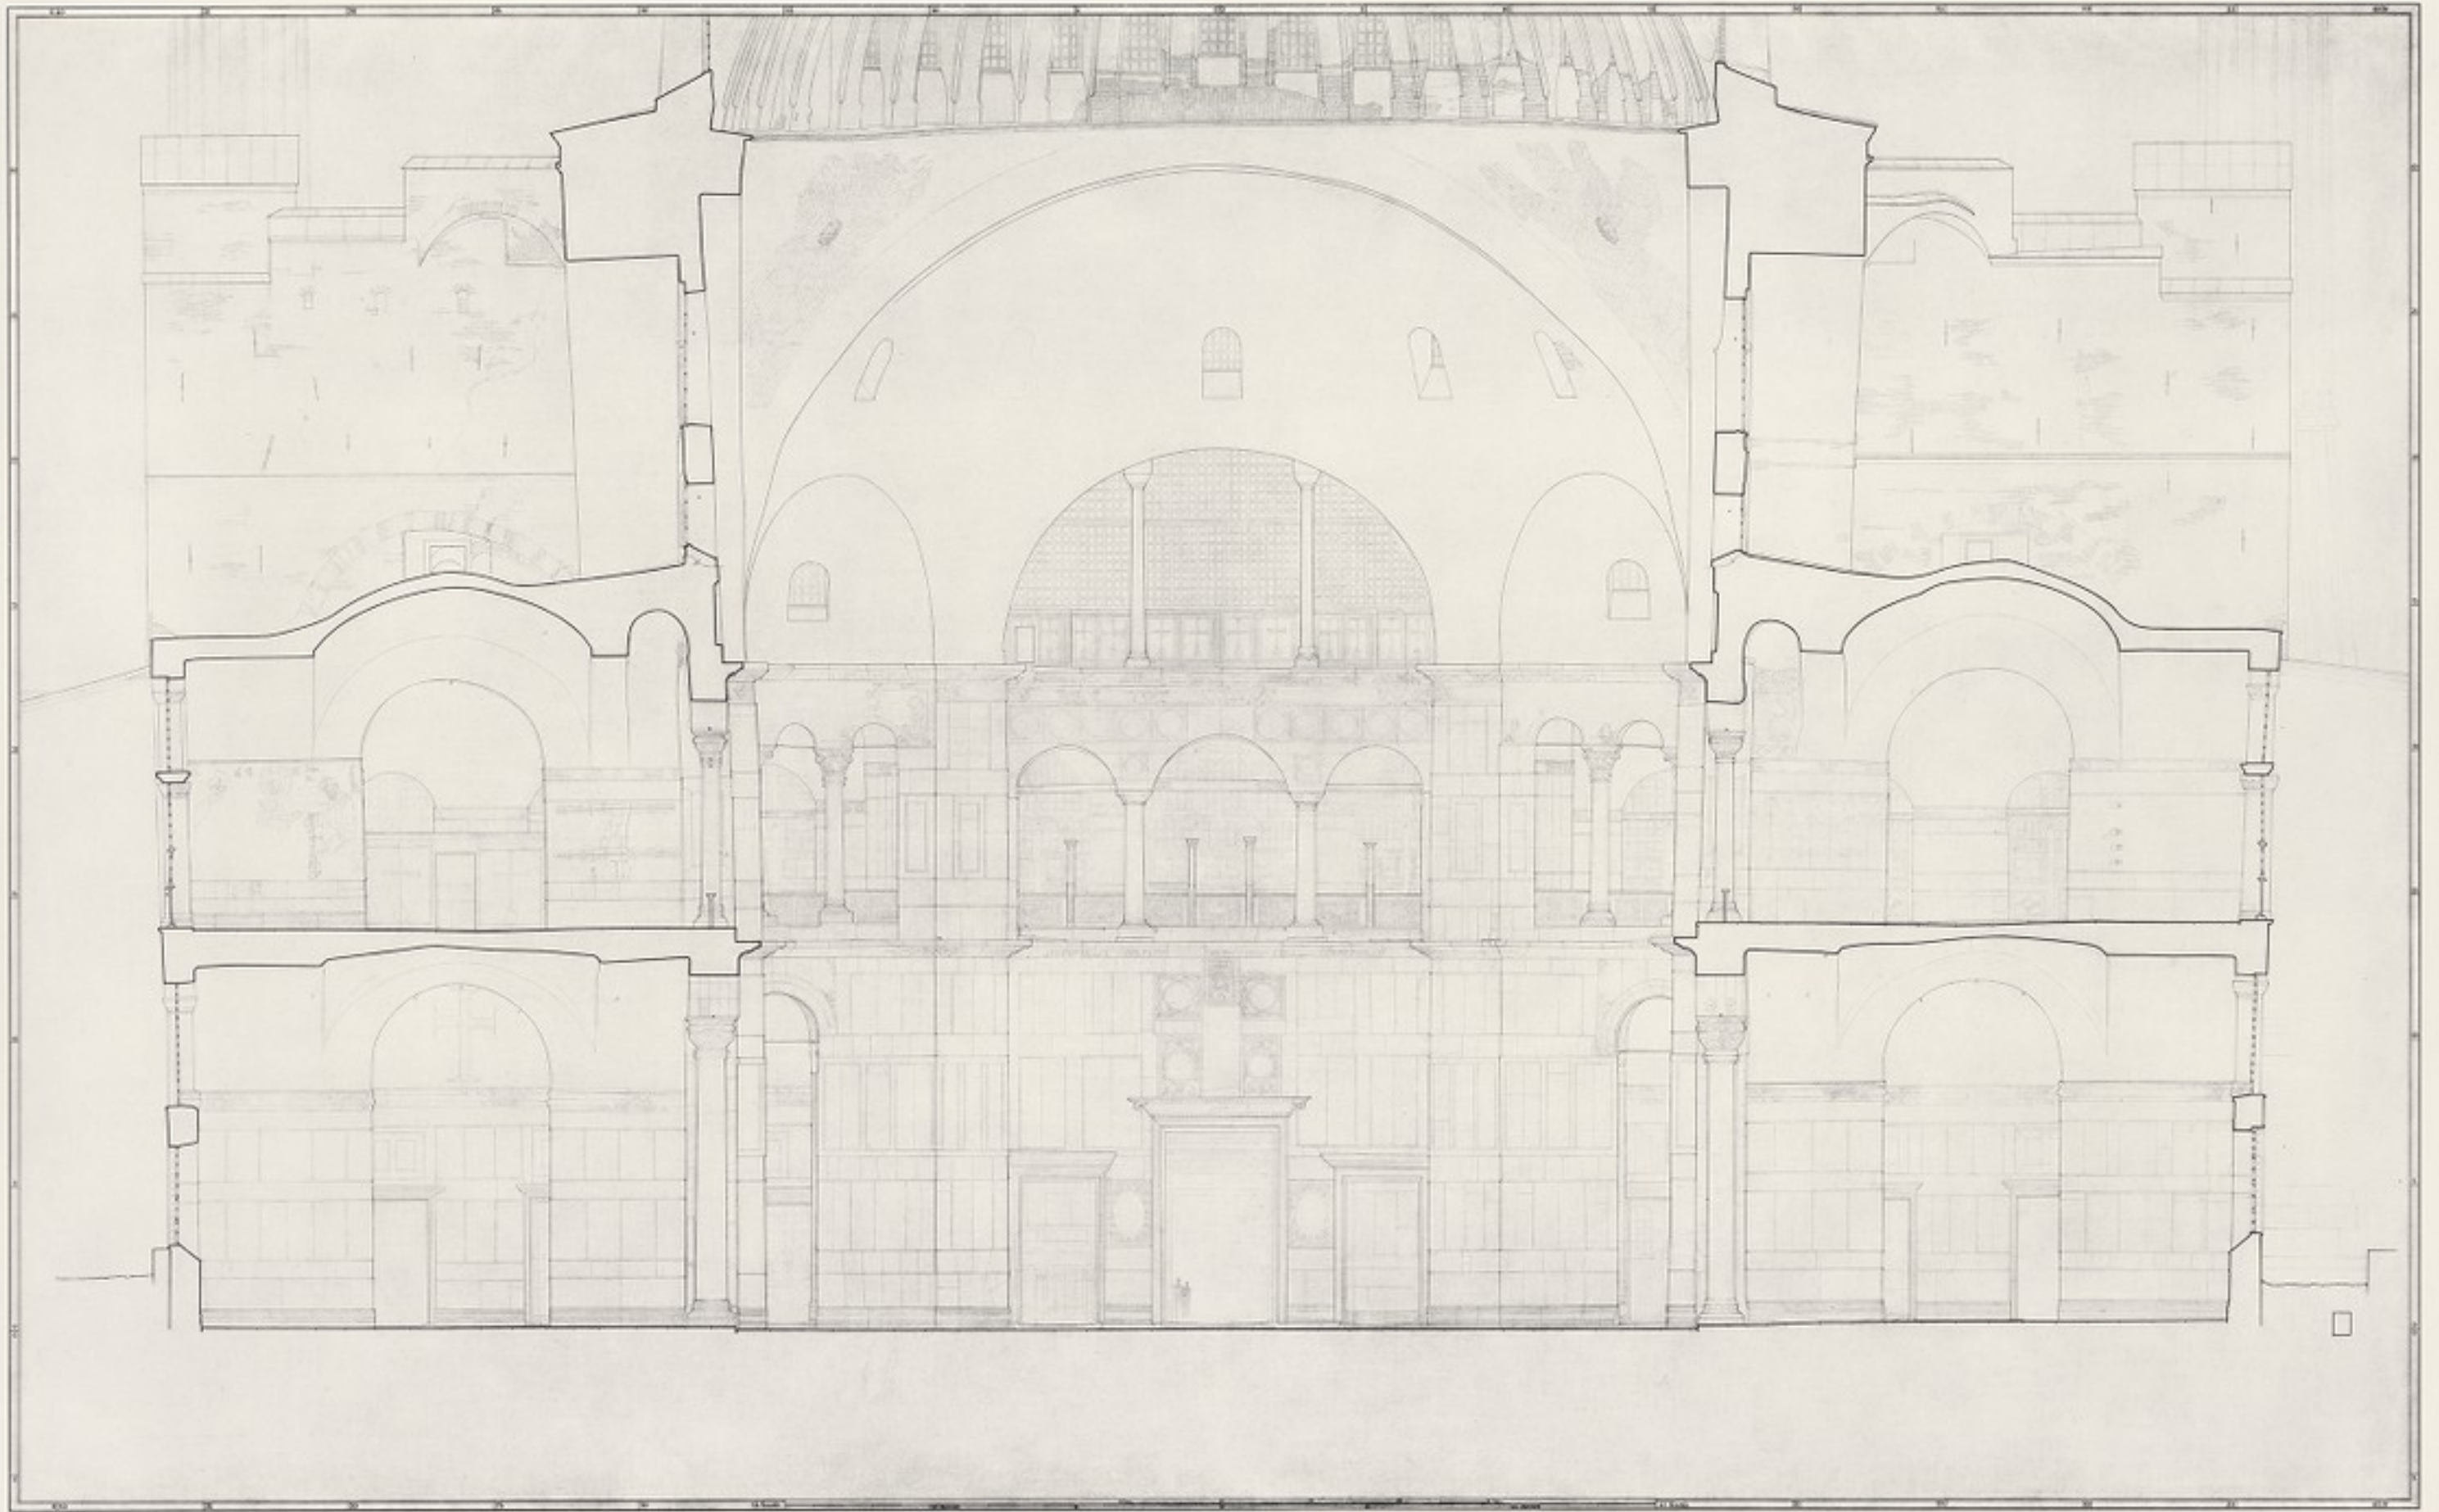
TRANSVERSE SECTION, LOOKING SOUTH
